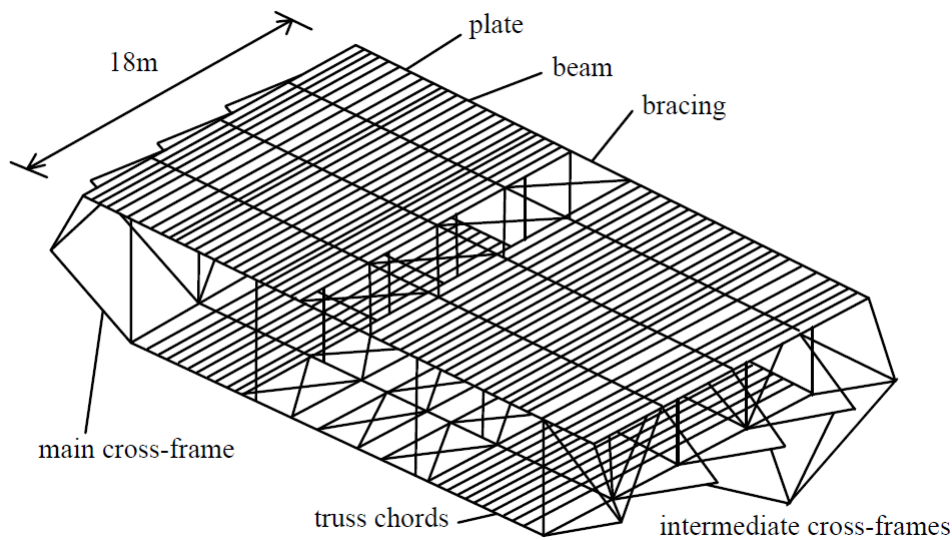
Hybrid Model - Deck segment of Tsing Ma Suspension Bridge (Xu & Xia, 2011)
